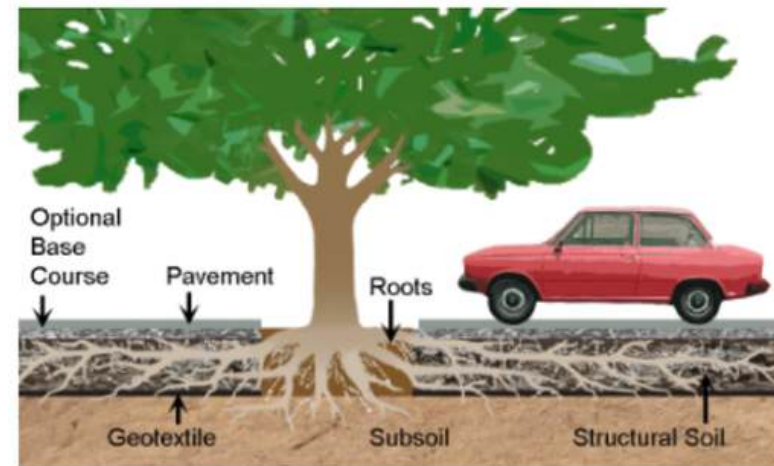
A suspended pavement system employing the use of structural soils and geotextiles (Day and Dickinson 2008).
